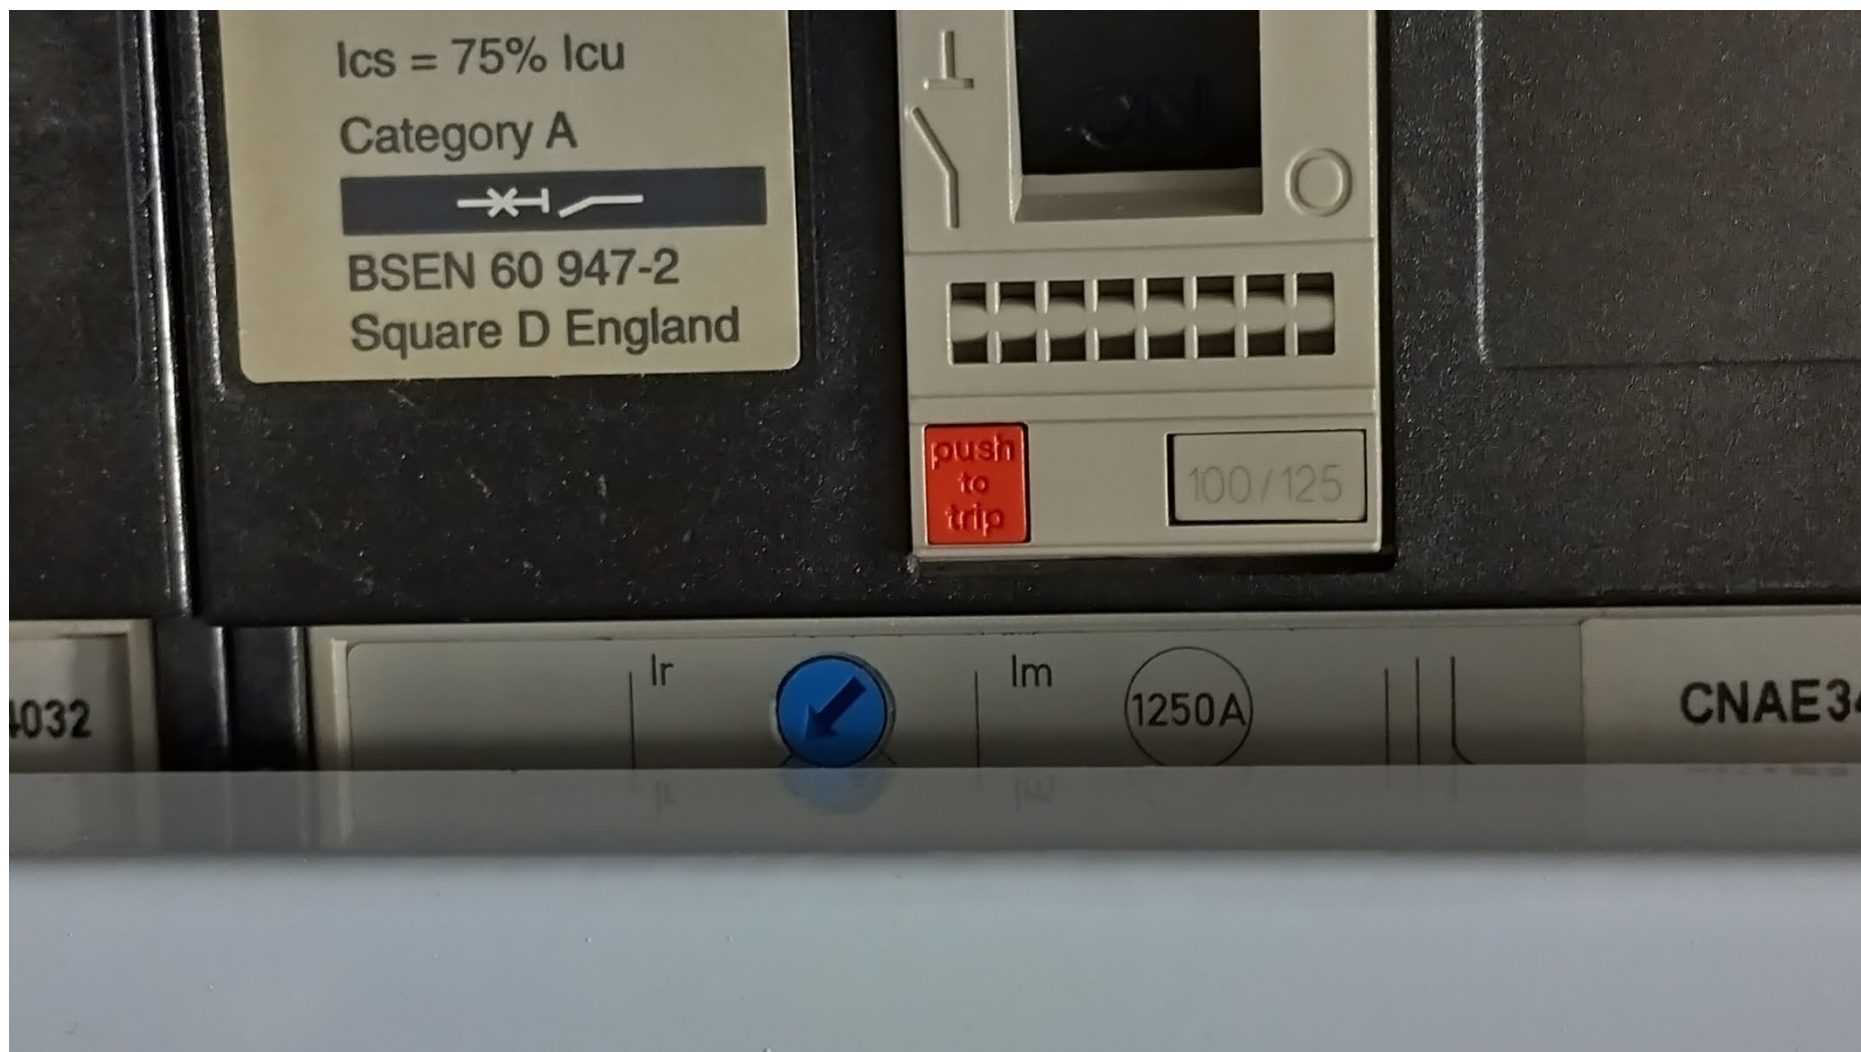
Detail of breaker capacity in main intake panel feeding lightly loaded “DB Roof void” board (this photo: Chilgrove Hall)
